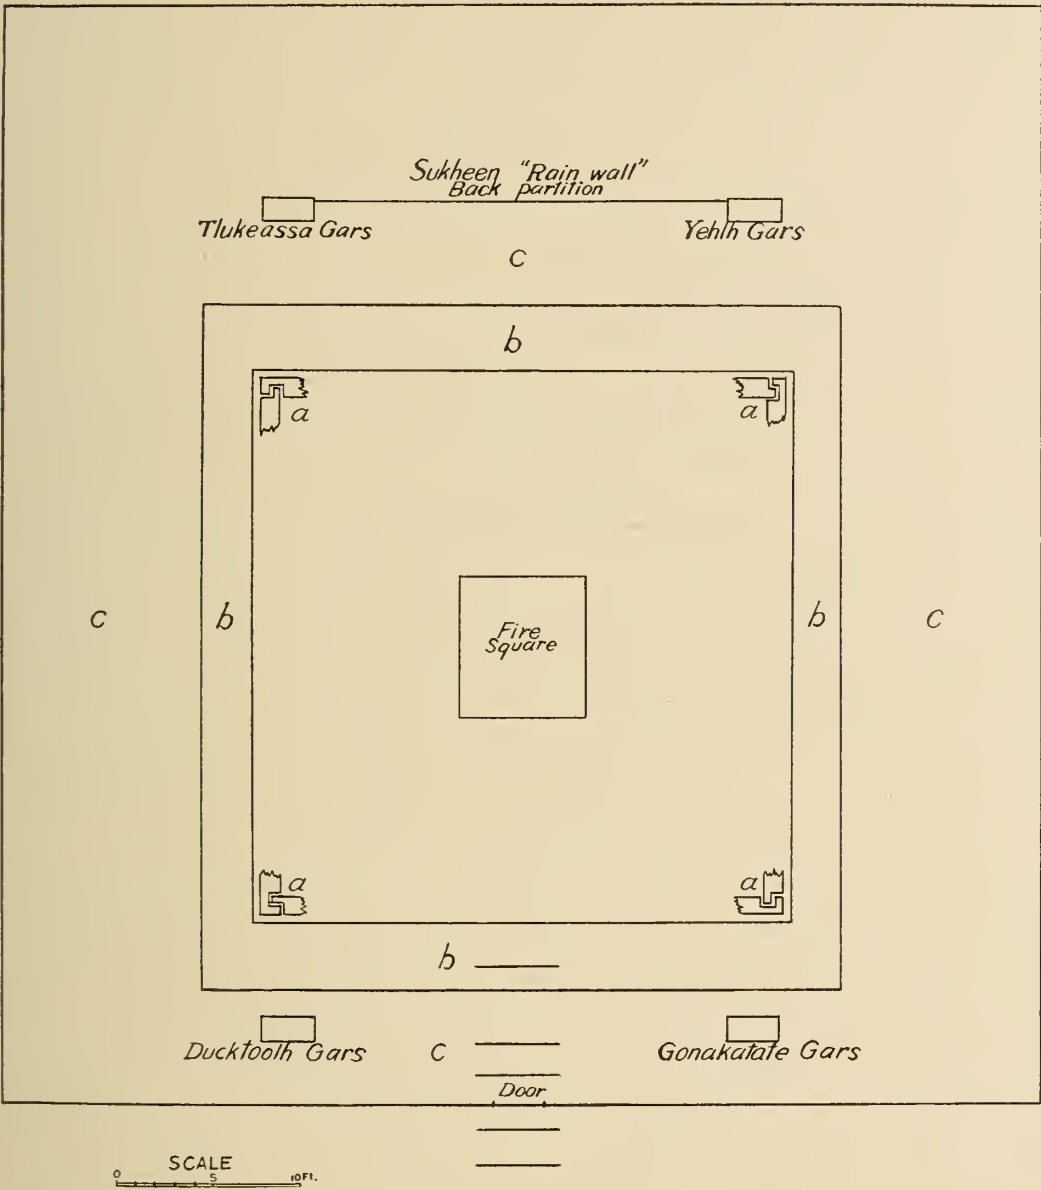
Groundplan of the Whale House. In size, it was 49 ft. 10 in. front by 53 ft. deep. From a plan drawn by the author.
